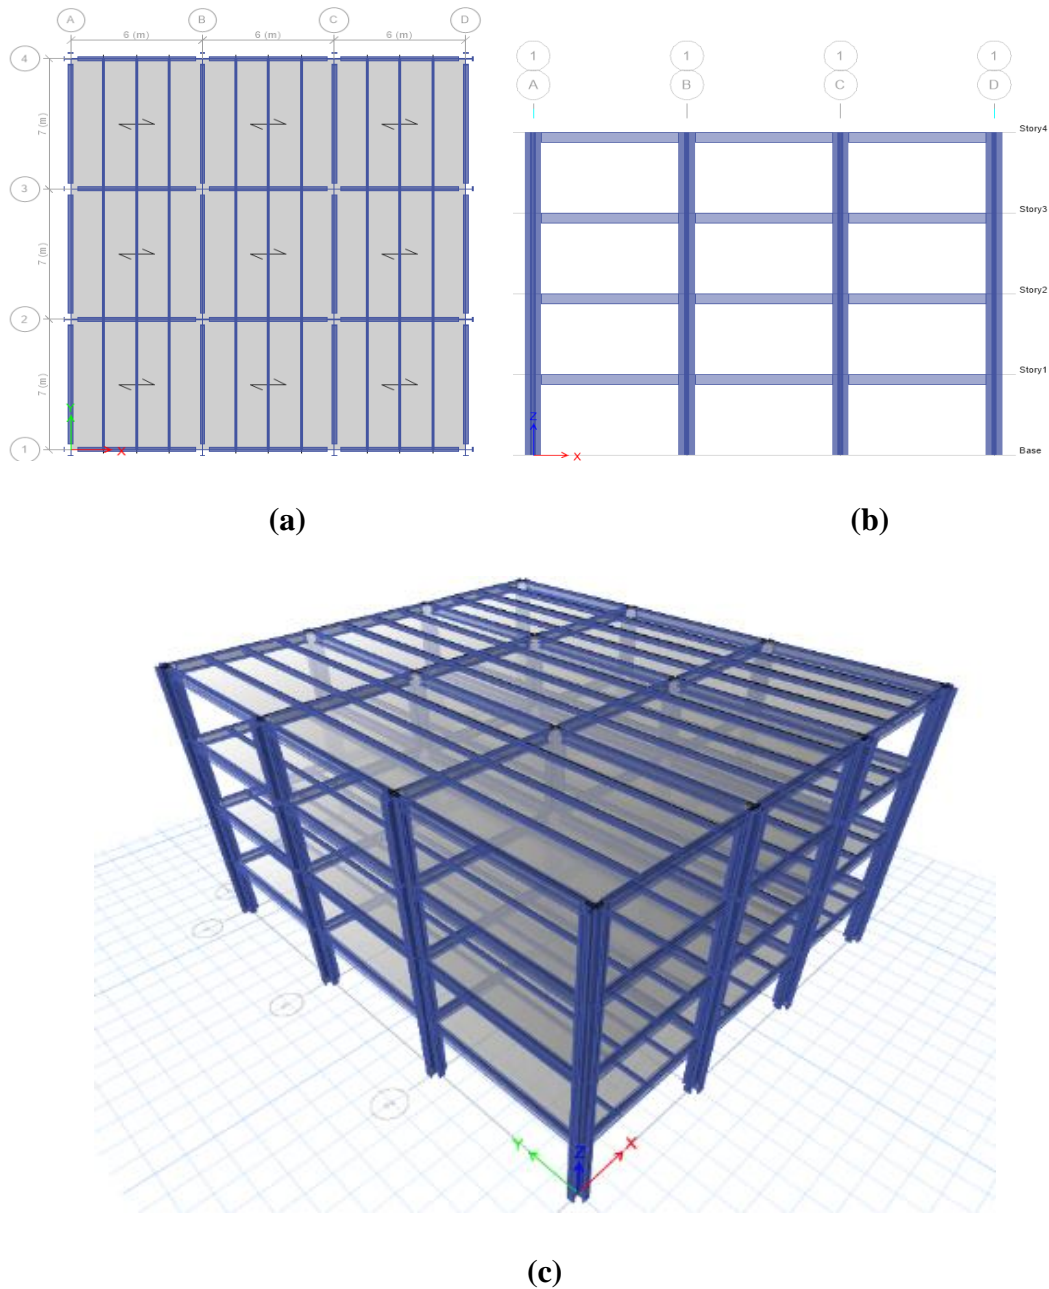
(a) Structure Plan (SMRFs), (b) Structure Elevation (SMRFs) and (c) 3D Rendered Model (SMRFs)
